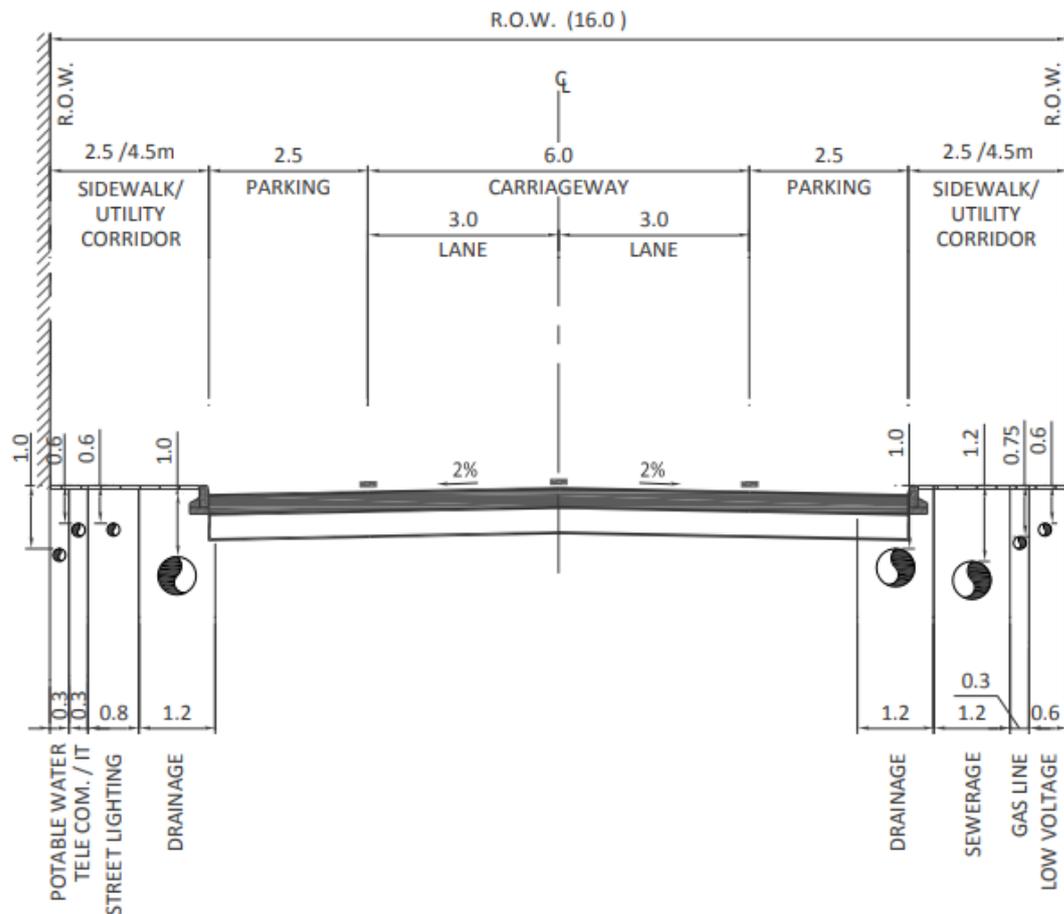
Typical Cross Section Single for Carriageway/ Roads
